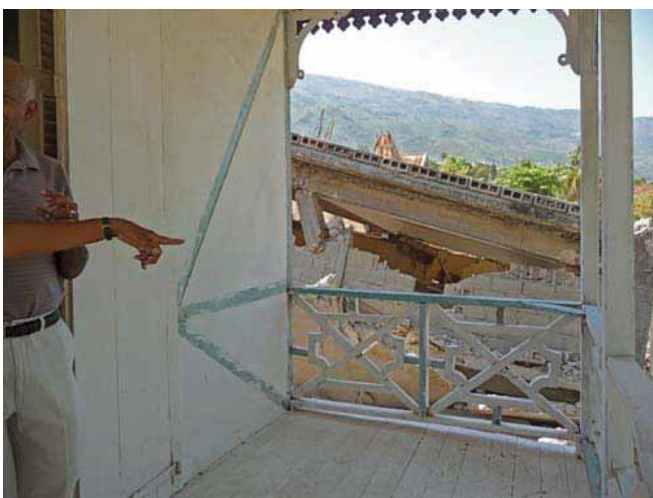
Owner of Rue 5 Jose Marti points to adjacent collapsed concrete and concrete block school building.
